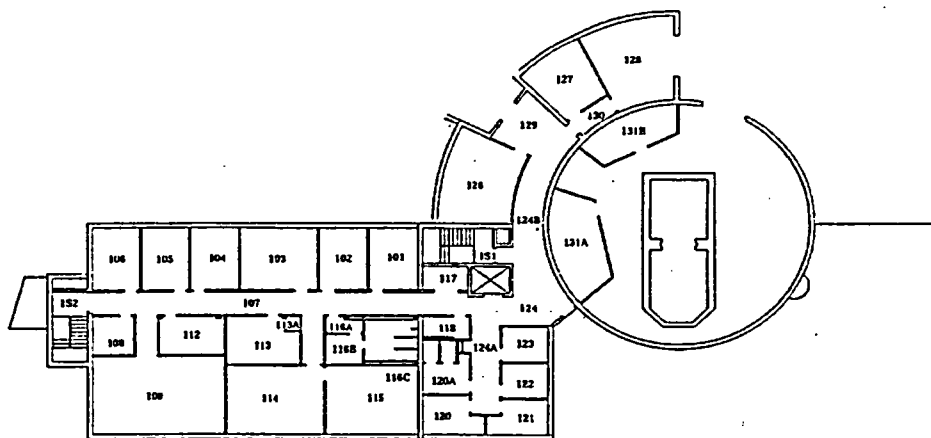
UVA Reactor Mezzanine Floor Plan
